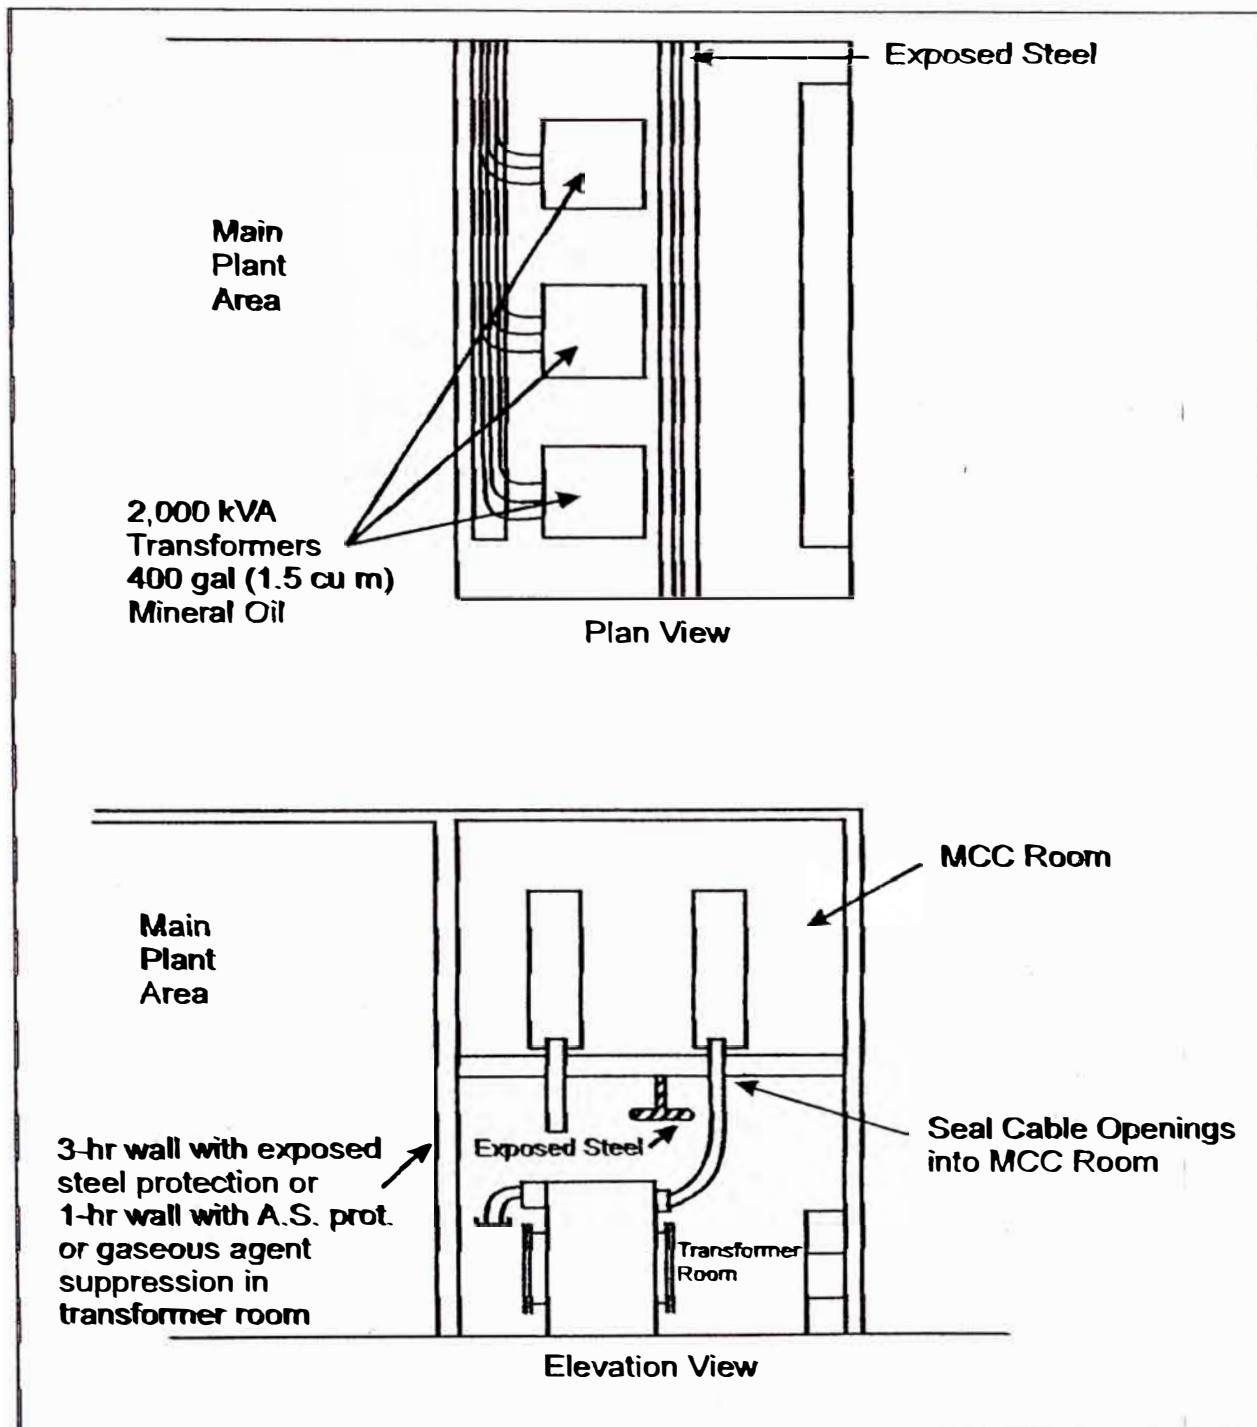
Plan and elevation view of transformer room and MCC room containing three mineral oil insulated transformers.
